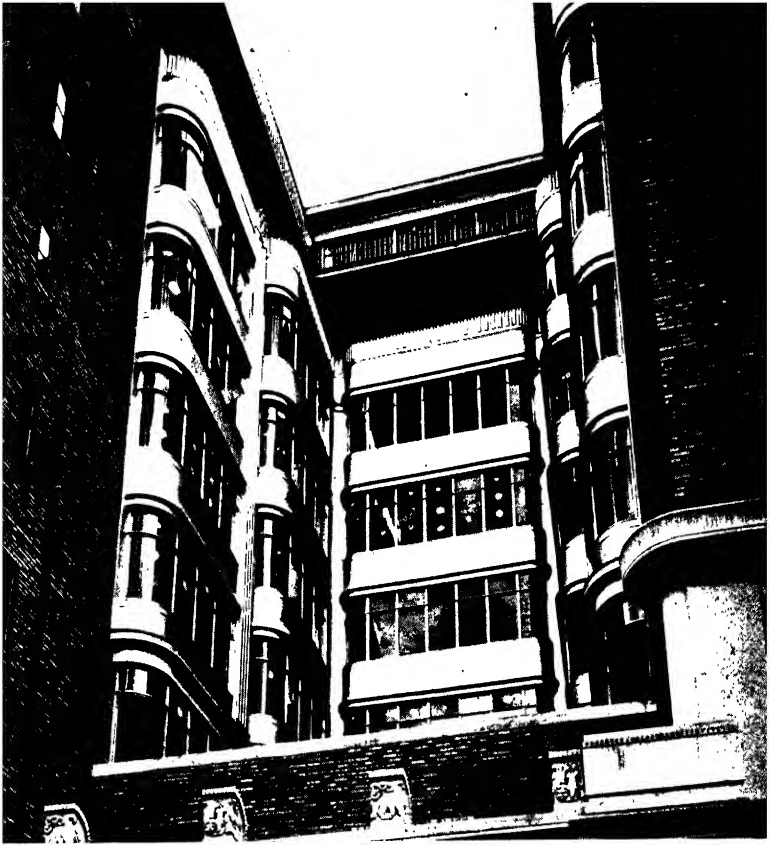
The cast iron window bays of the new Adelphi building, London. The external finish is aluminium paint, sprayed on. Details are shown on the plate opposite. Architects: Stanley Hamp, F.R.I.B.A. (Collcutt and Hamp).
